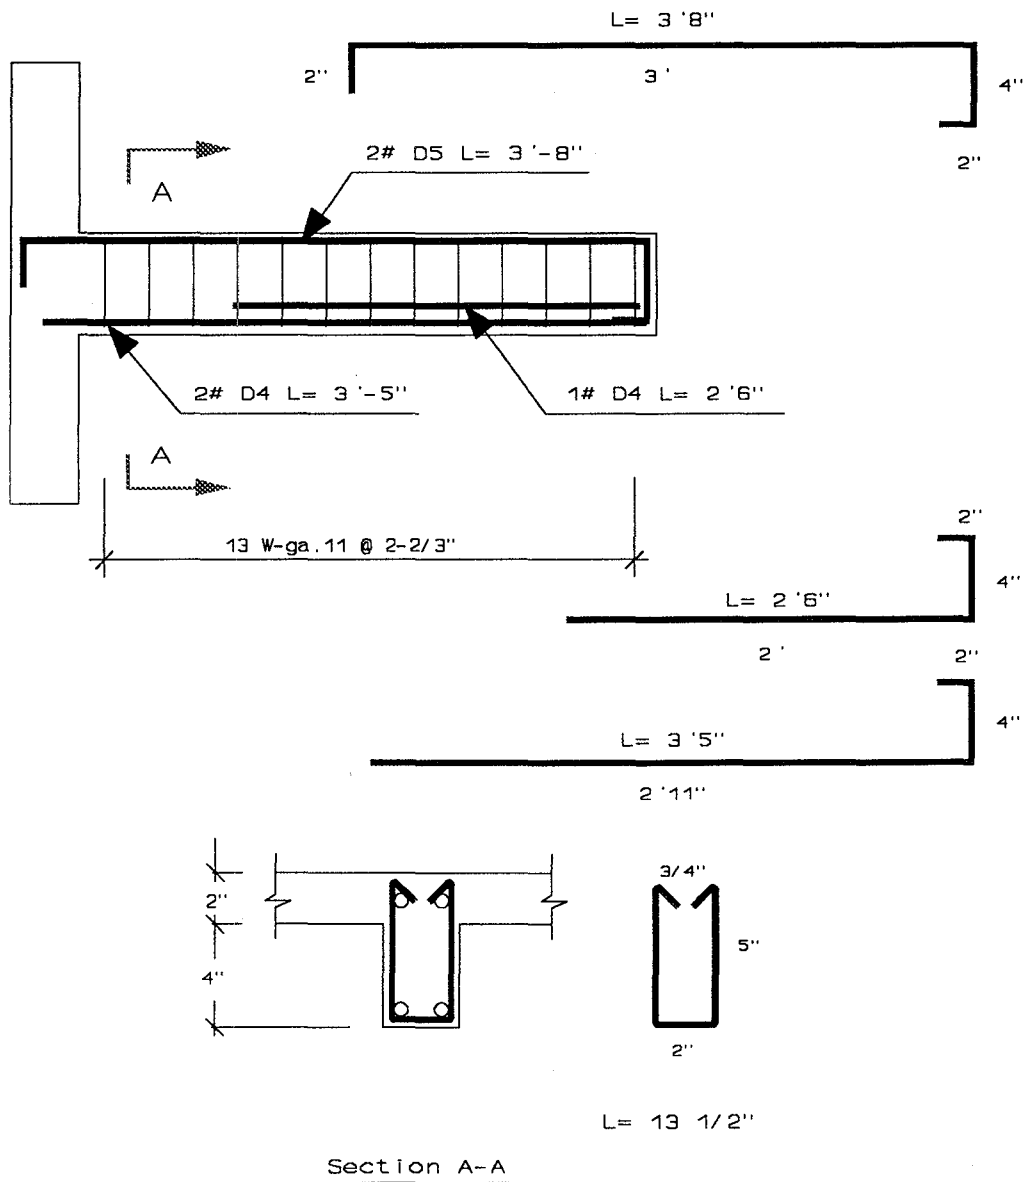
Longitudinal Beam for Exterior Subassemblage
